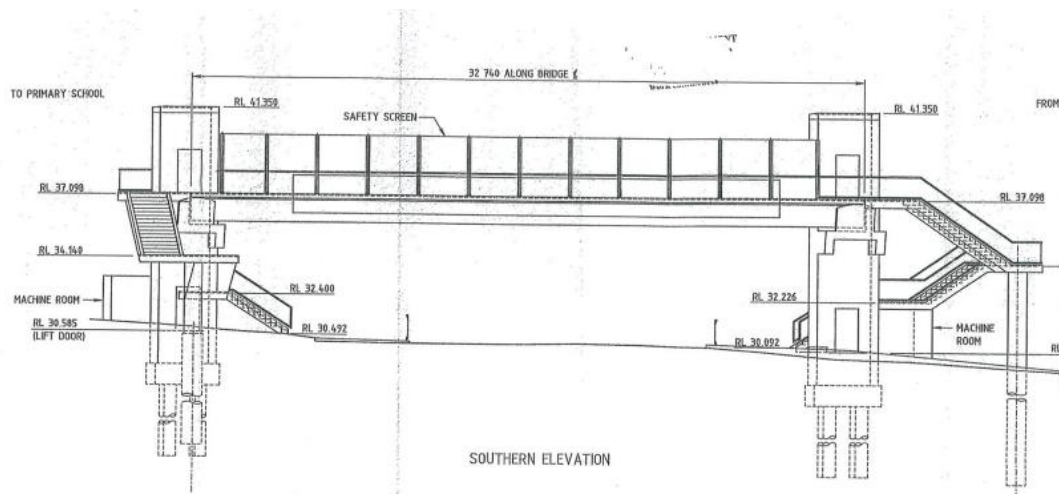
Stamped Plans – southern elevation (Source: DPHI)
